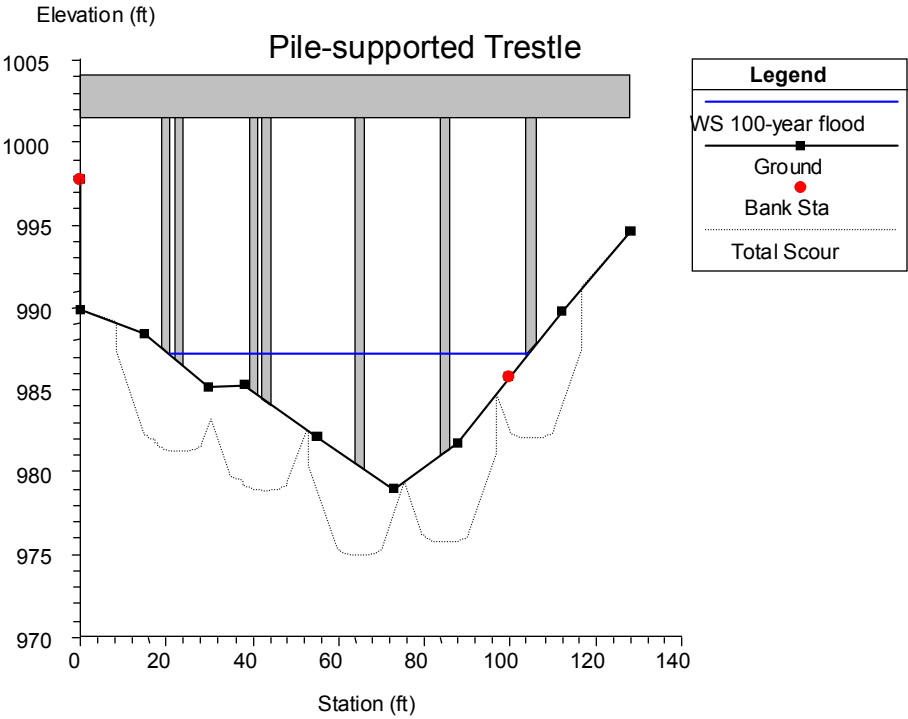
Pile-supported trestle with 1:20 (5%) constructed riffle.
